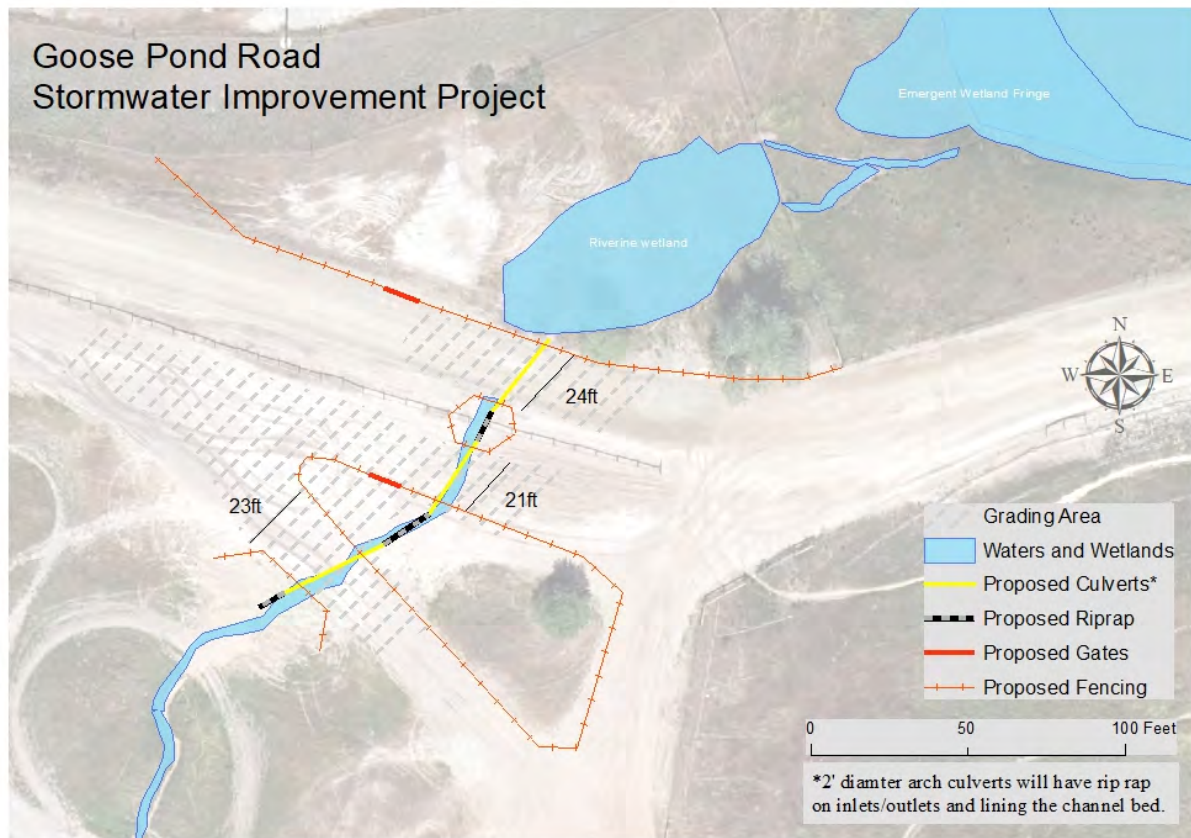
Goose Pond Stormwater Improvement Project conceptual design
